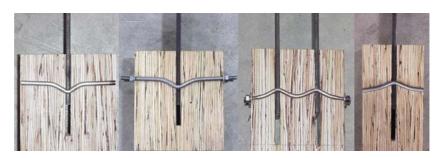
Deformed Fasteners (Series D, E, F and G)
